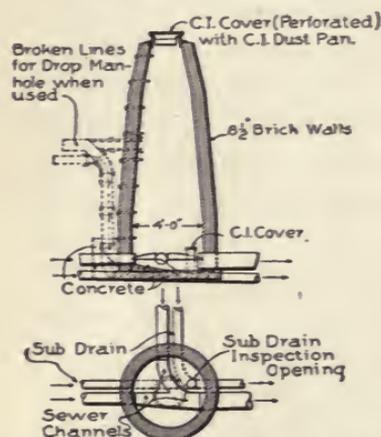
Sectional Elevation and Plan of Sewer Manhole.
